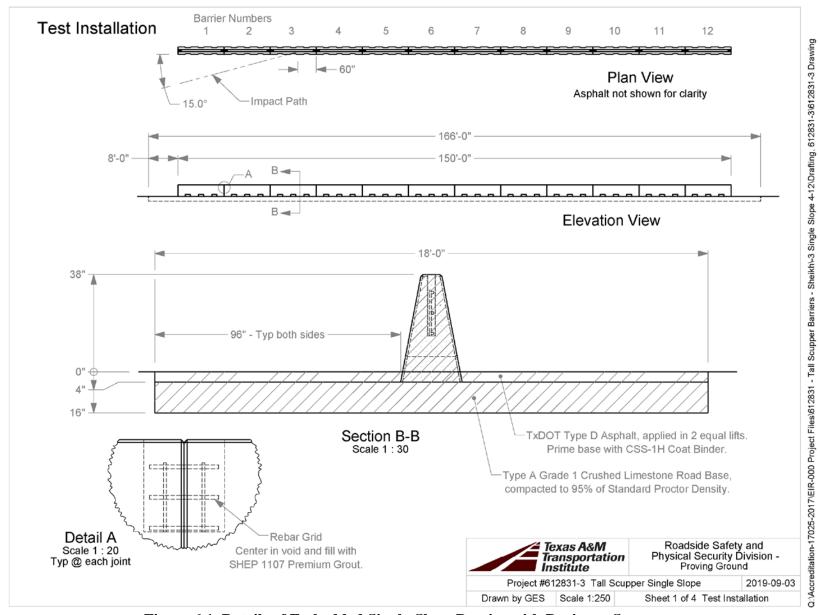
Details of Embedded Single-Slope Barrier with Drainage Scuppers.
